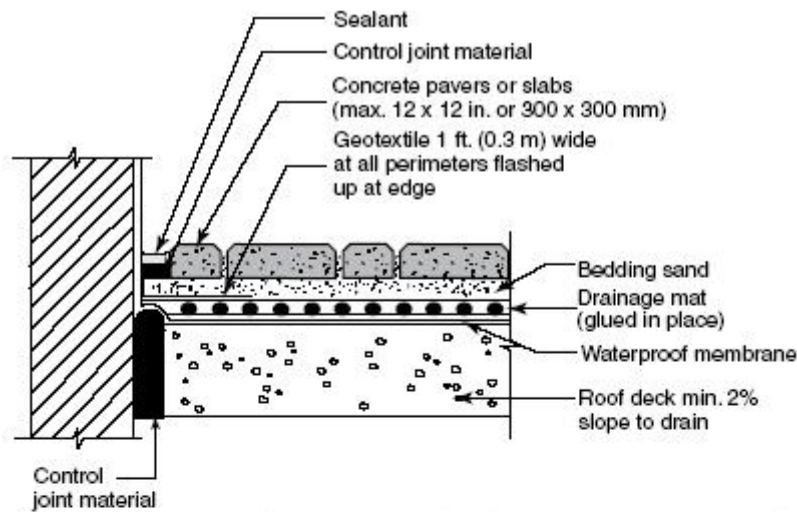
Detail at building wall *not* joined to decking using paving units and bedding sand with a drainage mat for pedestrian applications only
